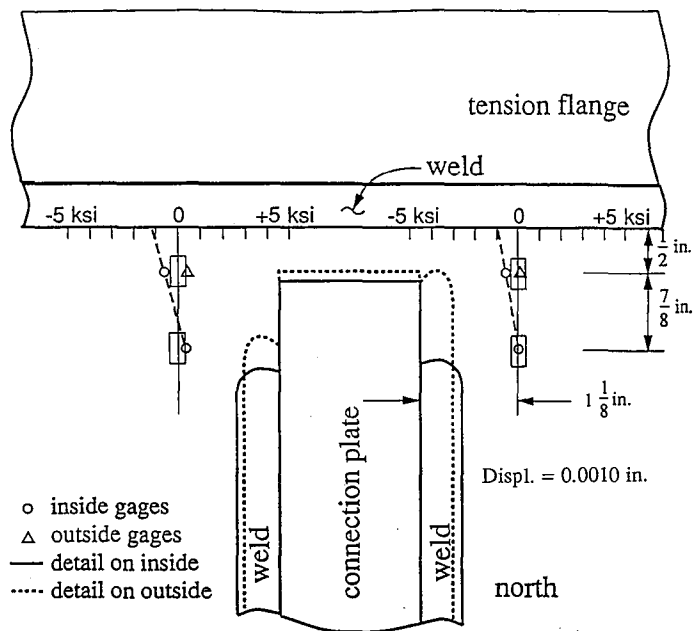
Static Stress Distribution on Outside Girder at Pier S7-5 (84 in. Girder) After Retrofit with Dump Truck in Outside Lane (Worst Case)
